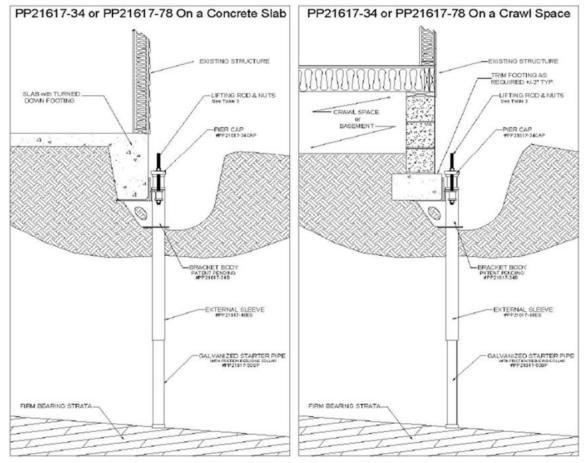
PP21617-34 BRACKET ASSEMBLY
